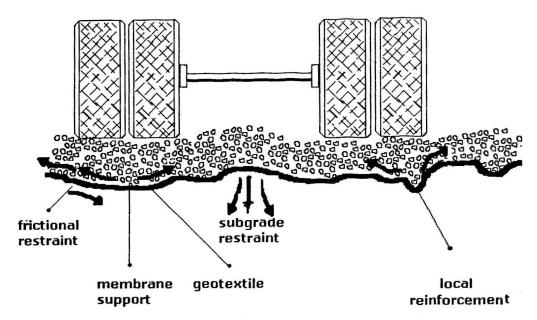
Ways in which a Geotextile Helps in Stabilizing an Unpaved Road
